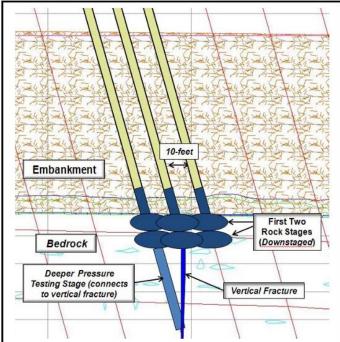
Illustration of downstage grouting immediately below an embankment dam (from Stare et al. [9], with permission from the American Society for Civil Engineers).
